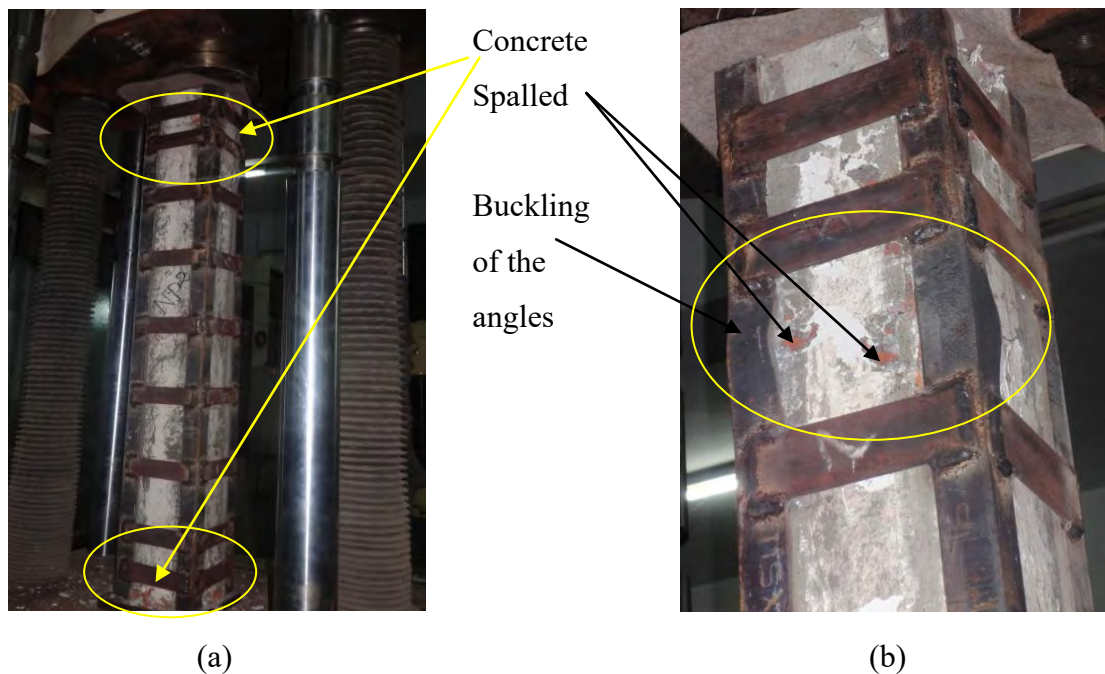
Failure mode of the strengthened RC column NP1.1, (a) Failure shape; and (b) Buckling of the angles and appearance of the longitudinal steel bars
